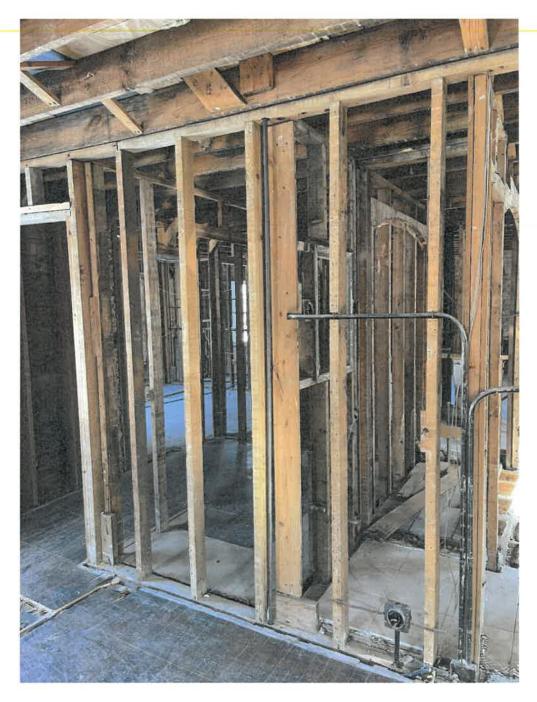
South Wing (Second Floor) -1 of 2 tie rods through wall framing connected through to roof framing with carpenter built timber truss/beam at ceiling framing. Tie rods and truss/beam do not have any apparent structural purpose and probably distribute roof loads to undersized ceiling and floor framing members, contributing to structural failures and bouncy floors. Structural reinforcement of floor, ceiling and roof framing required.
